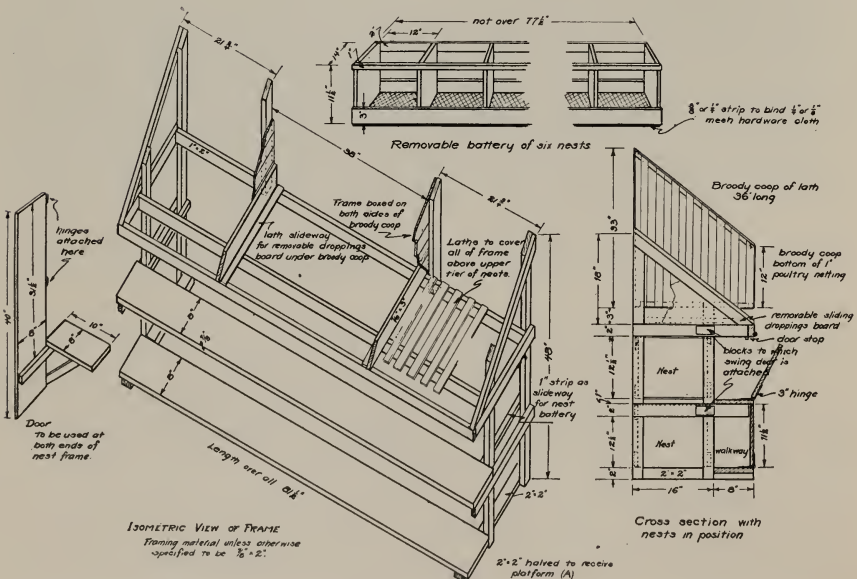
Working plans for the construction of nest and broody coop unit.
